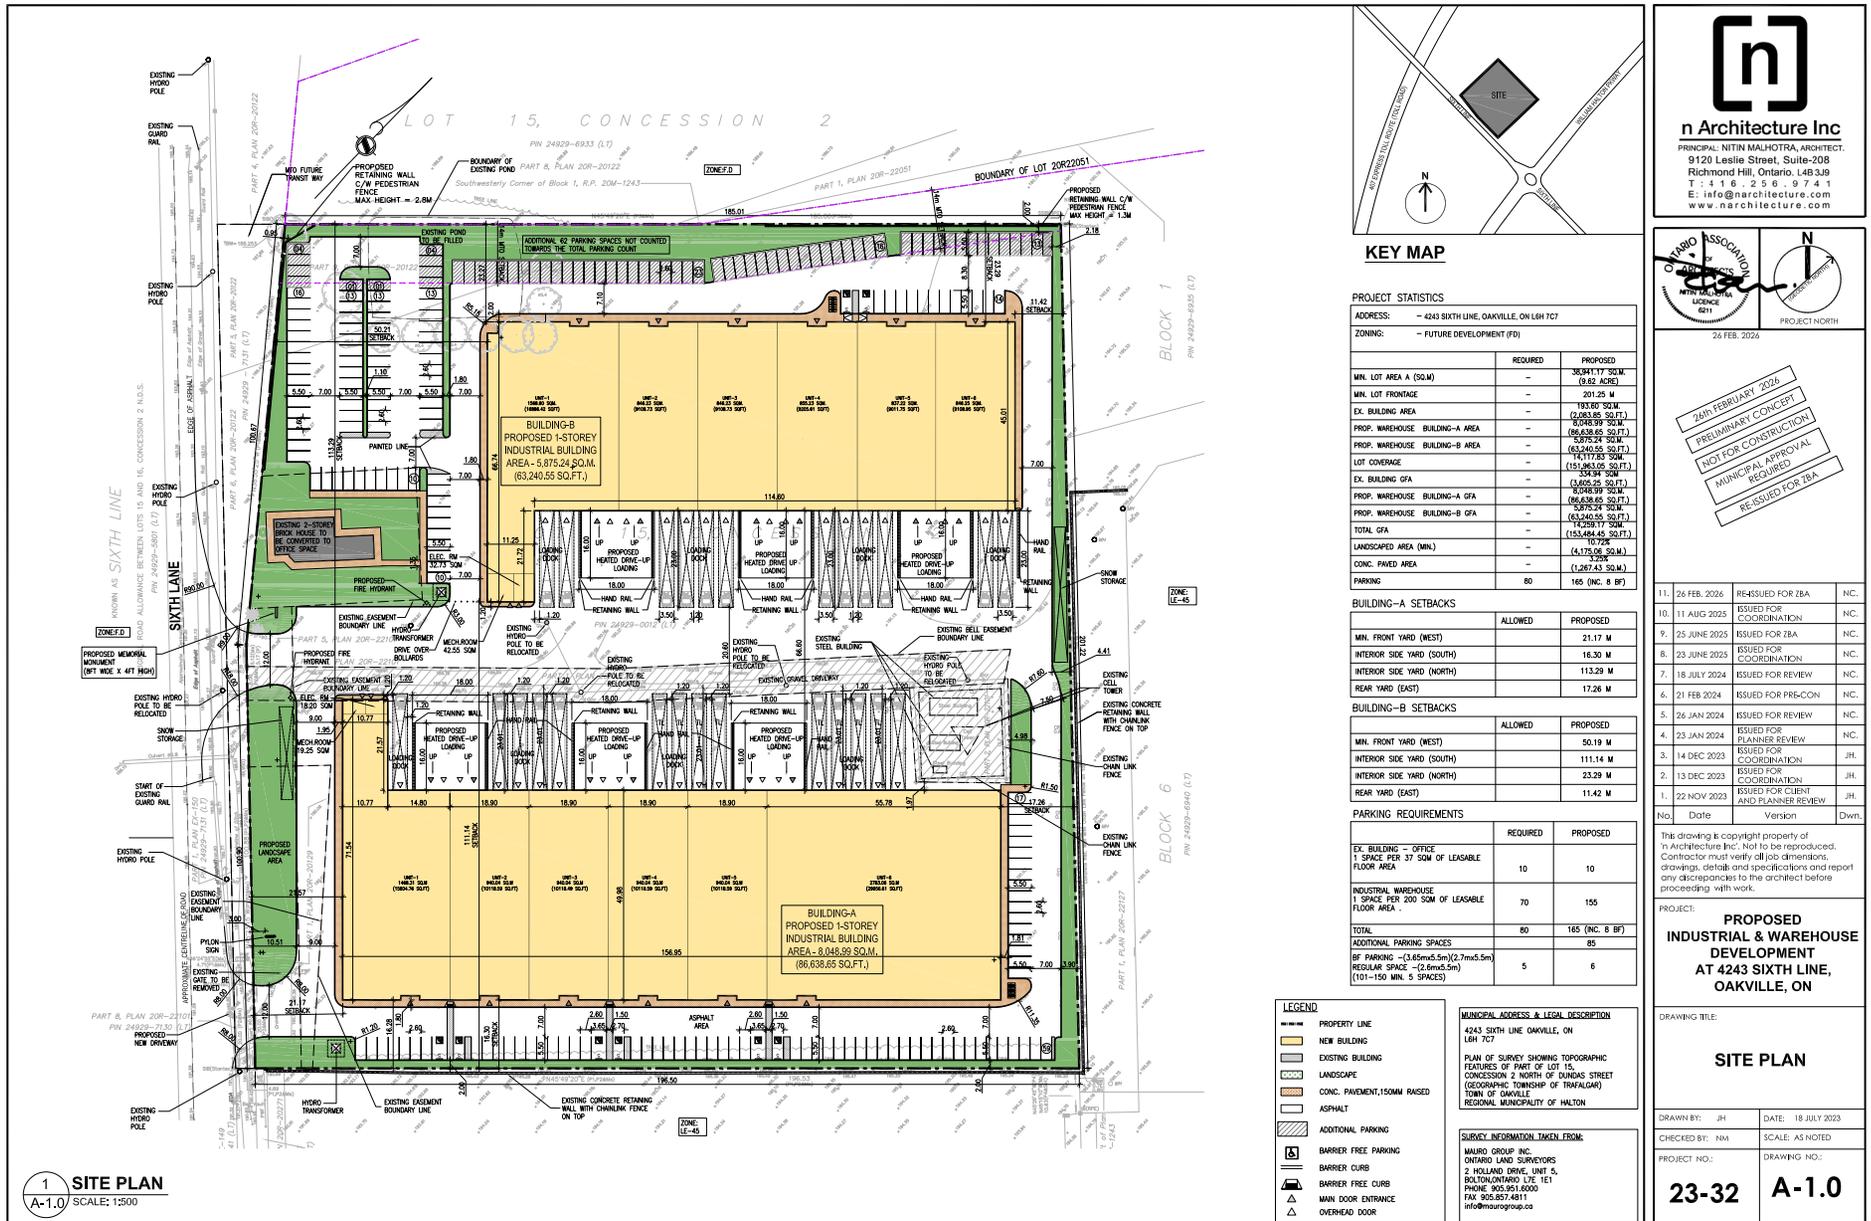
Proposed Site Plan, prepared by n Architecture Inc.
